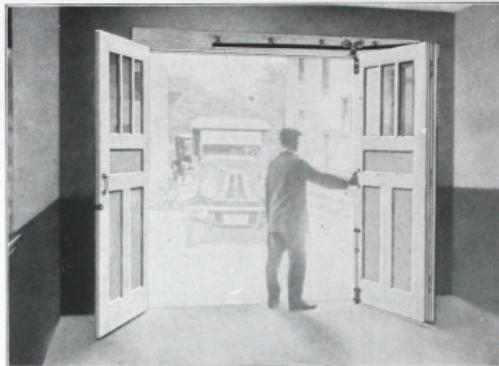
Doorway Equipped with No. 436 Fixtures
